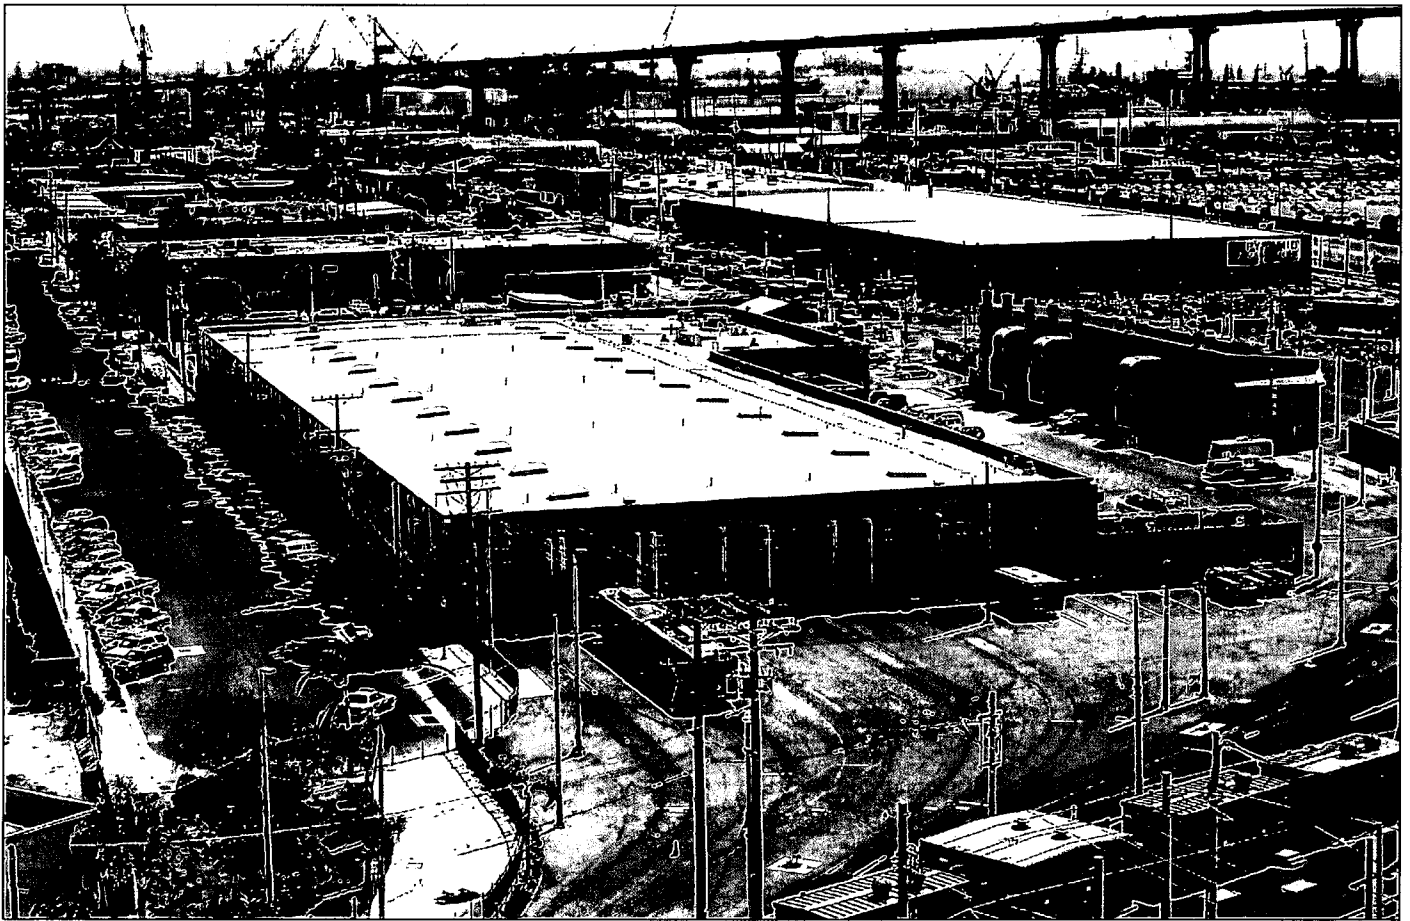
Building A was part of the original LRT plan in 1980. The second (lower portion) was added in 1986. Both structures are “butler buildings”, by construction type and are in need of significant rehabilitation.
